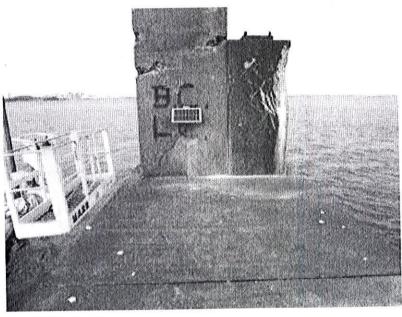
Photo 37 Appendix D Areas of Poor Consolidation on South Face of Pier 11 North Column
